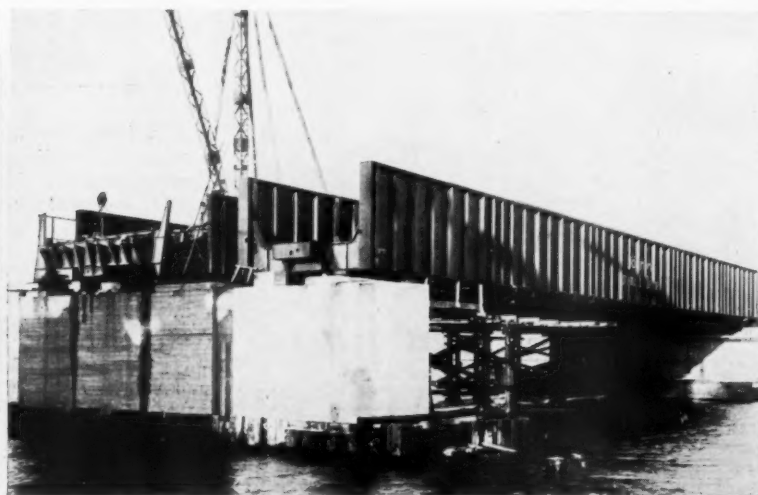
Welded 52-metre span with road bridge behind
